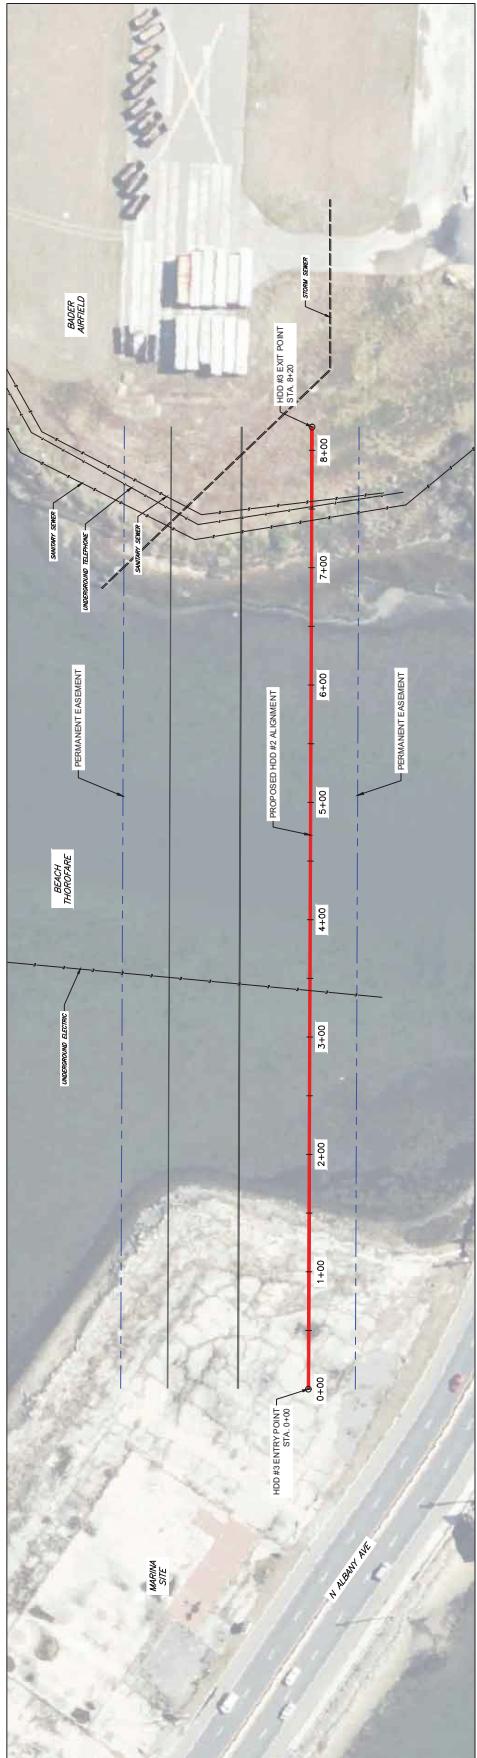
Great Thorofare Crossing #2 HDD Plan & Profile
